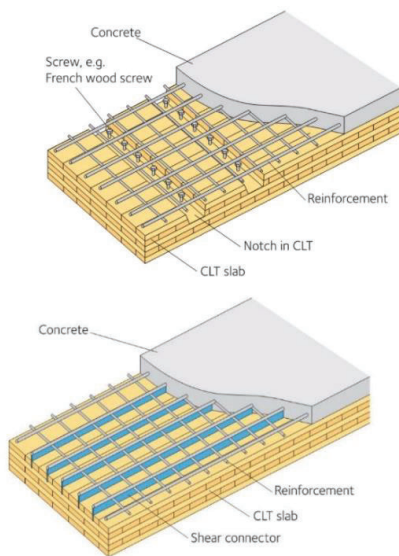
Timber Concrete Composite Floor System (© Arup, S. Tang)
